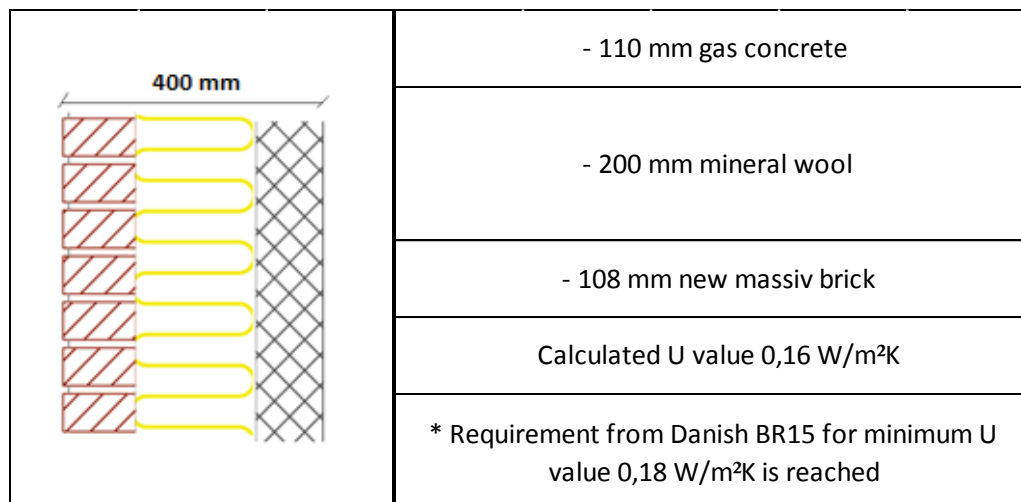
Insulation solution accounting for demolition of existing external façade and replacement with new thicker insulation and new brick finish.
